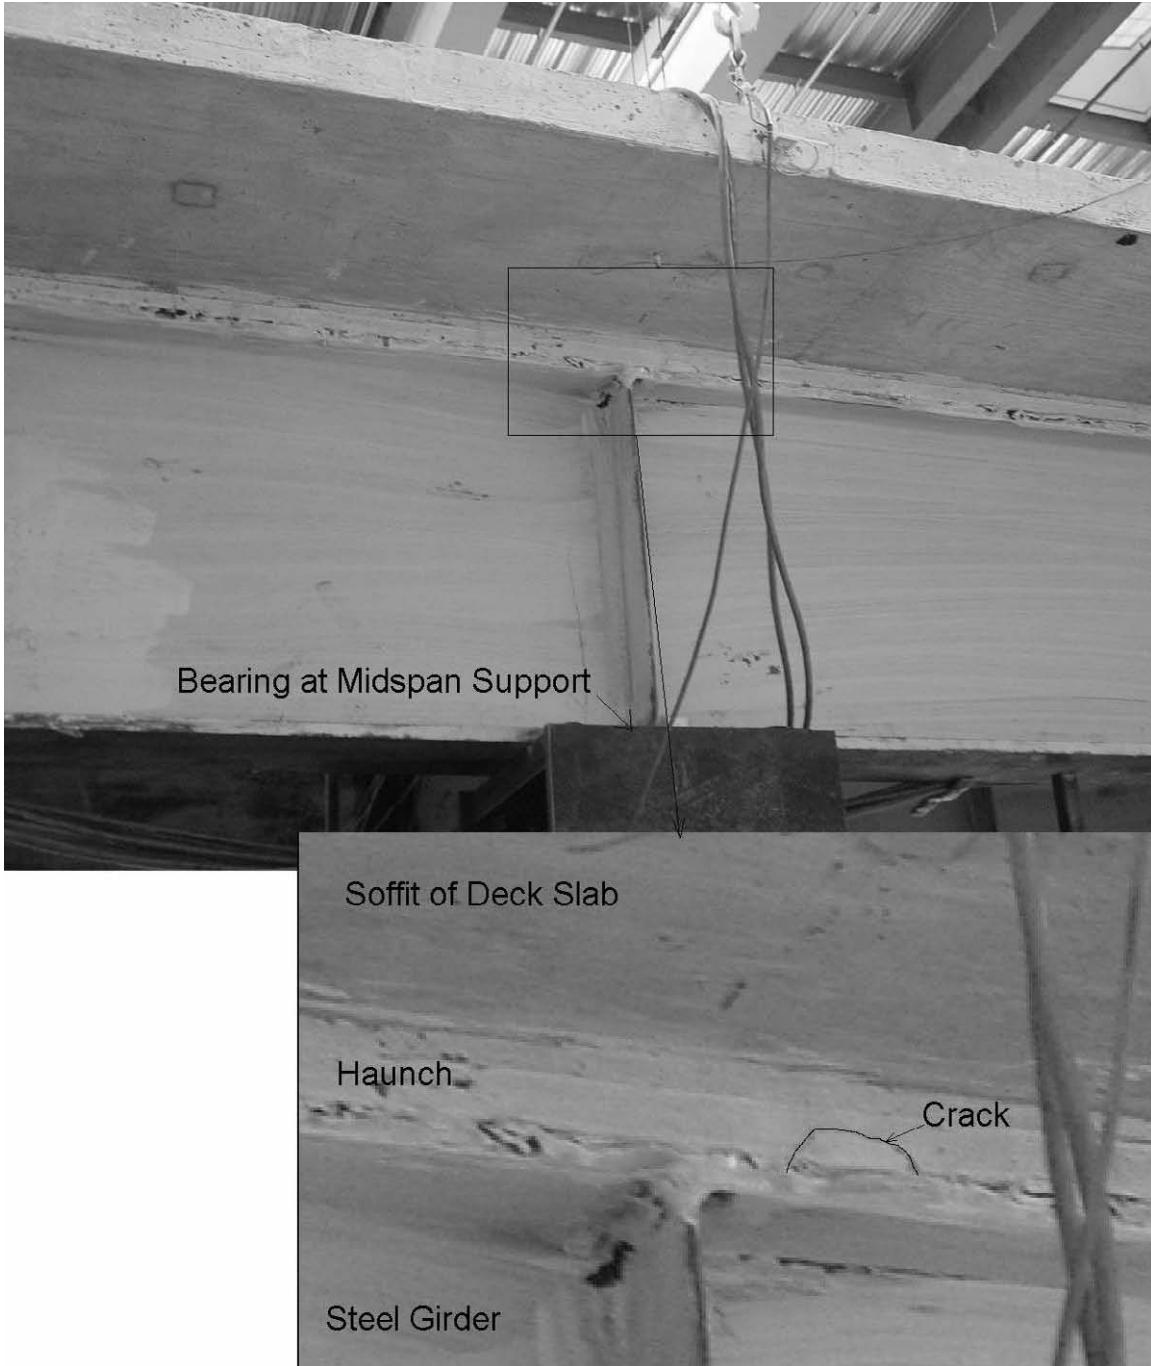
Haunch of deck slab and girder at midspan after maximum excitation at midspan resulting in 7% drift in the girders
